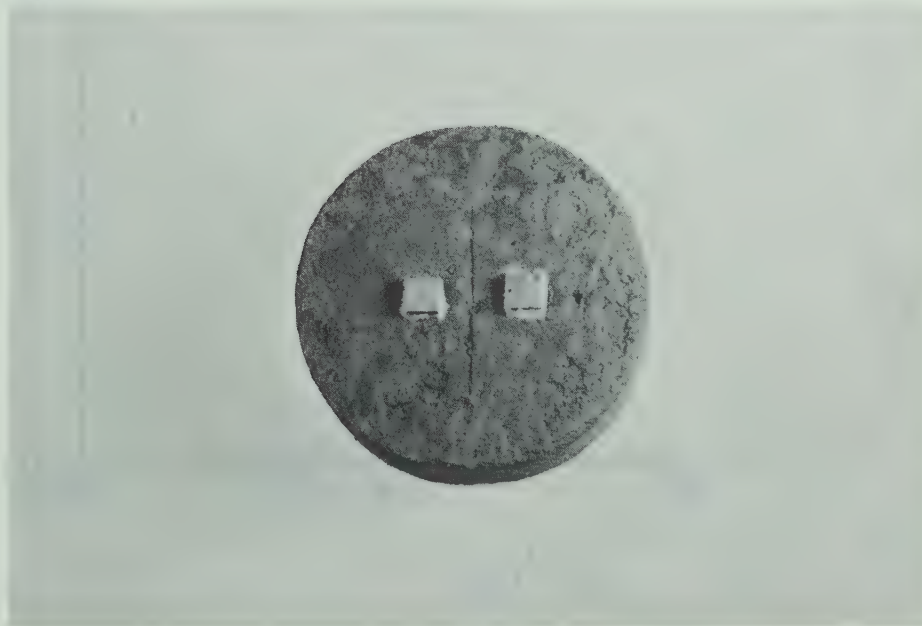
COMPONENTS FOR ATTACHING GAUGE
